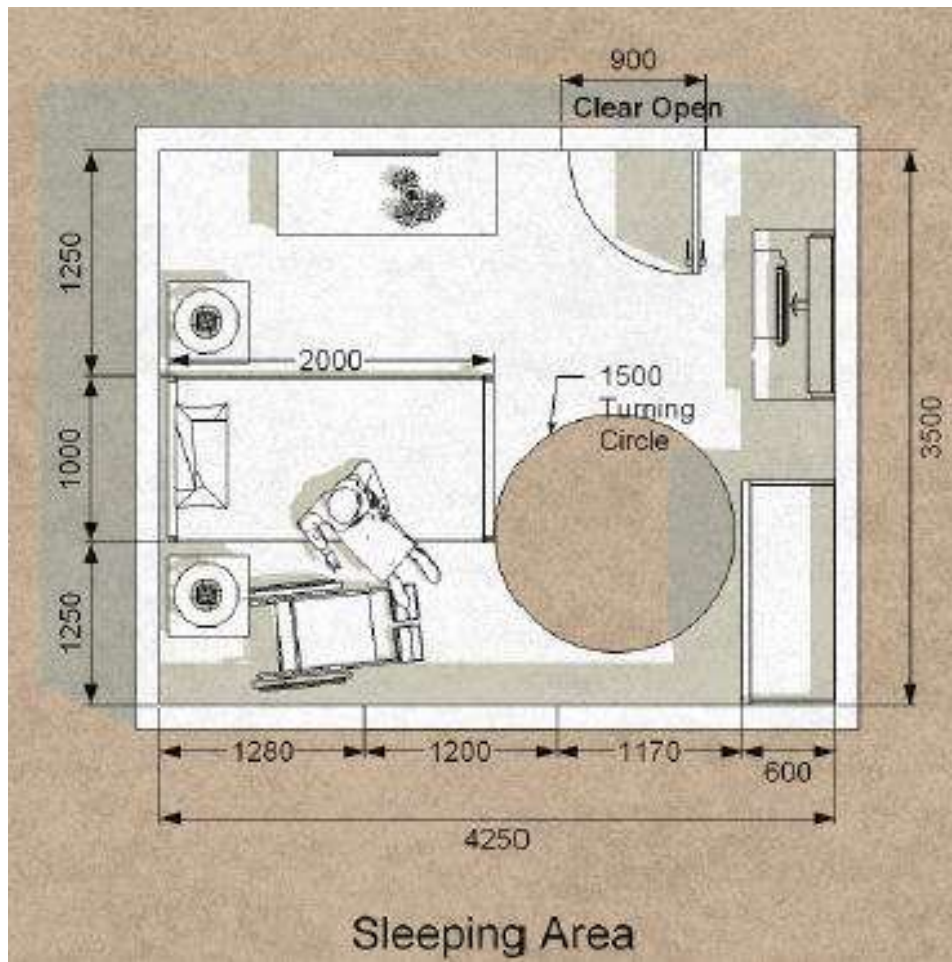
Sleeping Area/Bedroom. Drawing: Almodon
